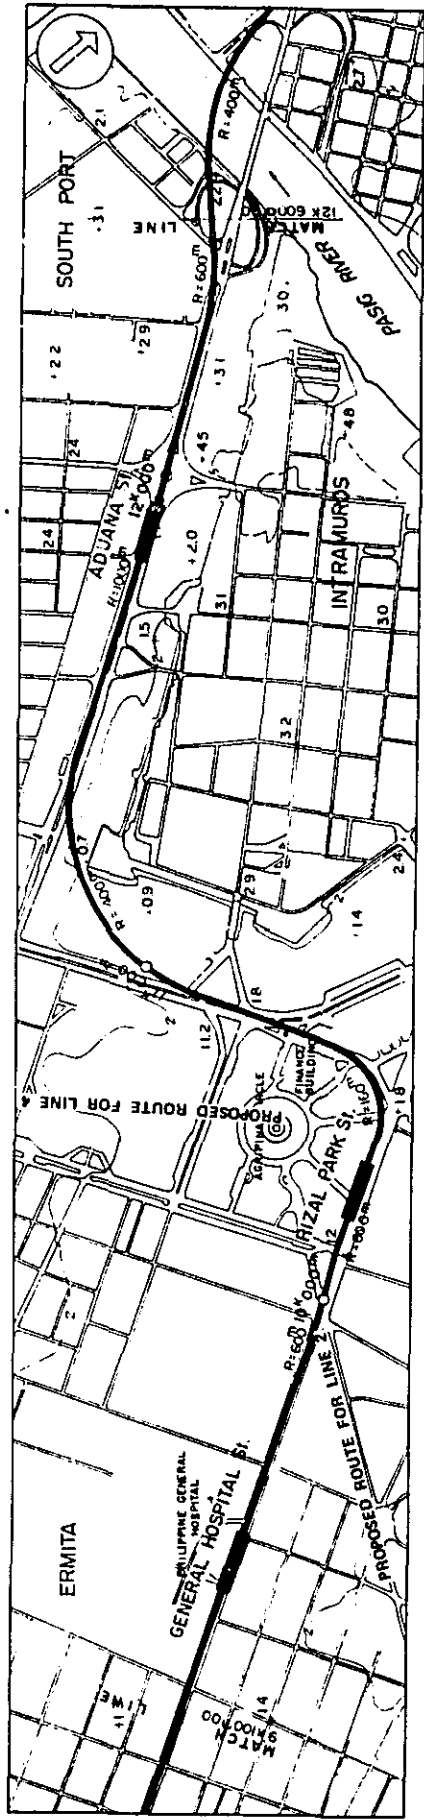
Plan and Profile of Recommended Alternative (3)
